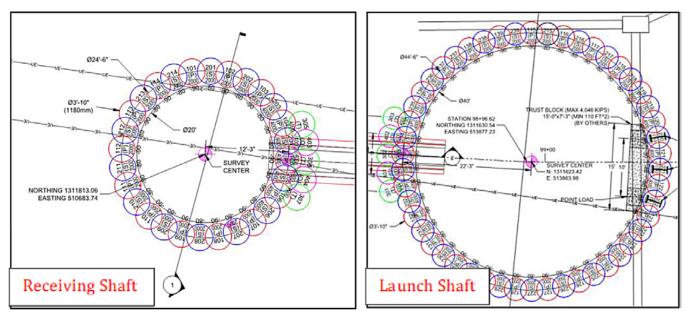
Plan Views of Secant Pile Wall Designs for Receiving and Launch Shafts (Excerpt from Primoris submittals, 2021)
